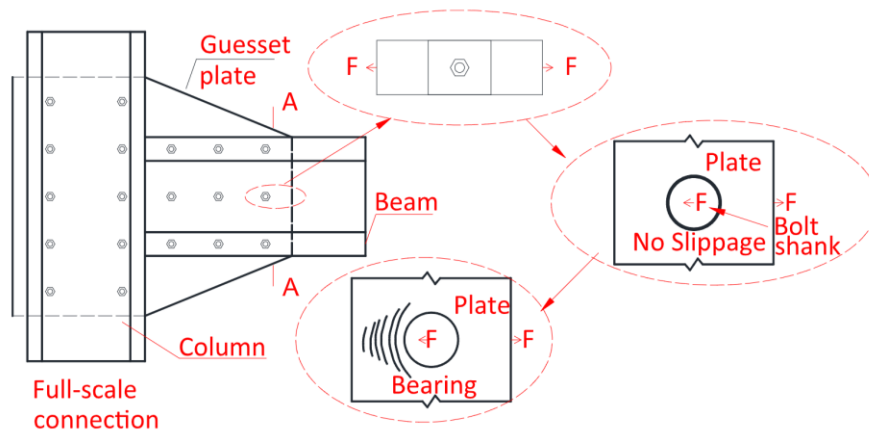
Bearing behavior of a single bolt against steel plate used in CFS bolted-moment connection [18].
